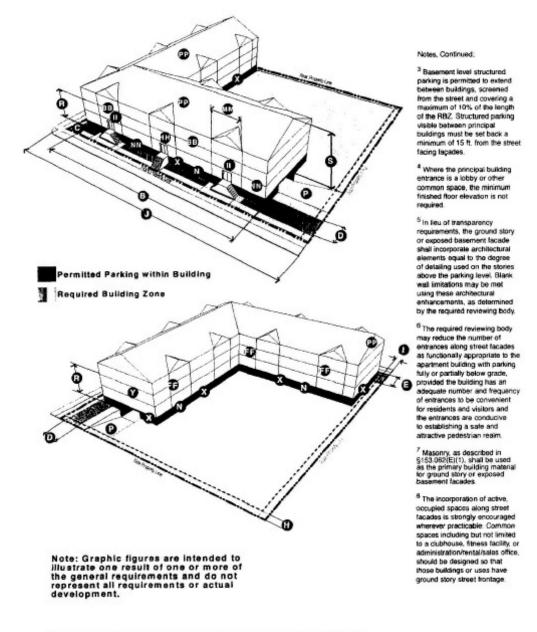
P: PODIUM APARTMENT BUILDING TYPE DIAGRAM.
